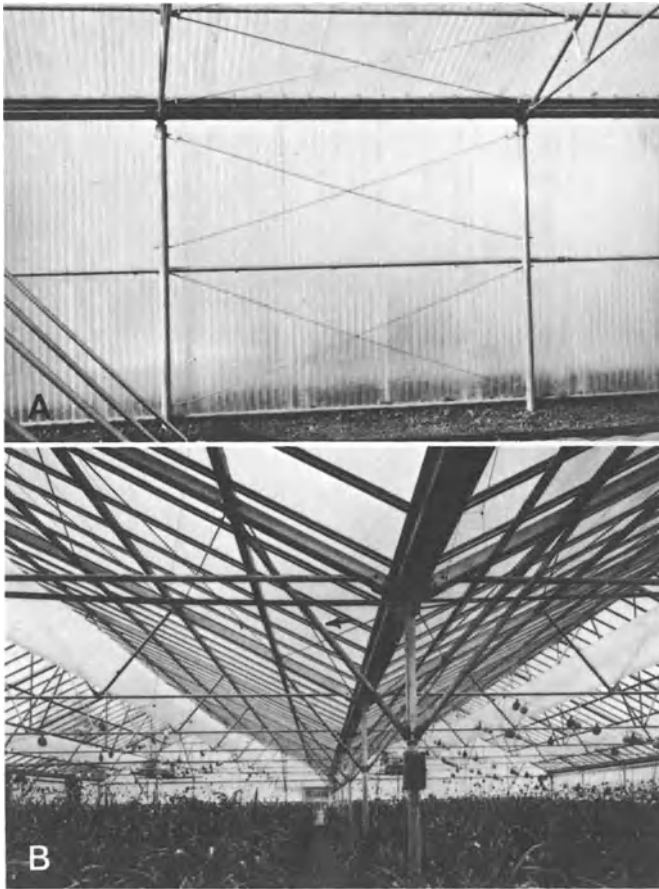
(A) Anti-sway bracing in roof and side wall sections. (Courtesy Nexus Corporation.) (B) Knee braces on ridge and furrow structure. (Courtesy Ickes-Braun Glass-houses)
